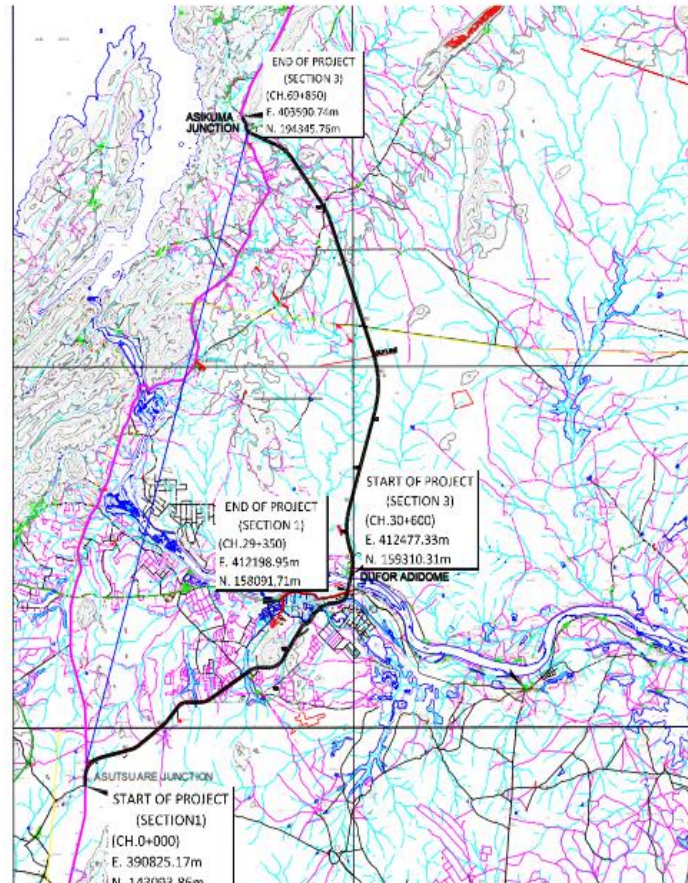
Final Alignments for Sections 1 and 3 Project Roads
